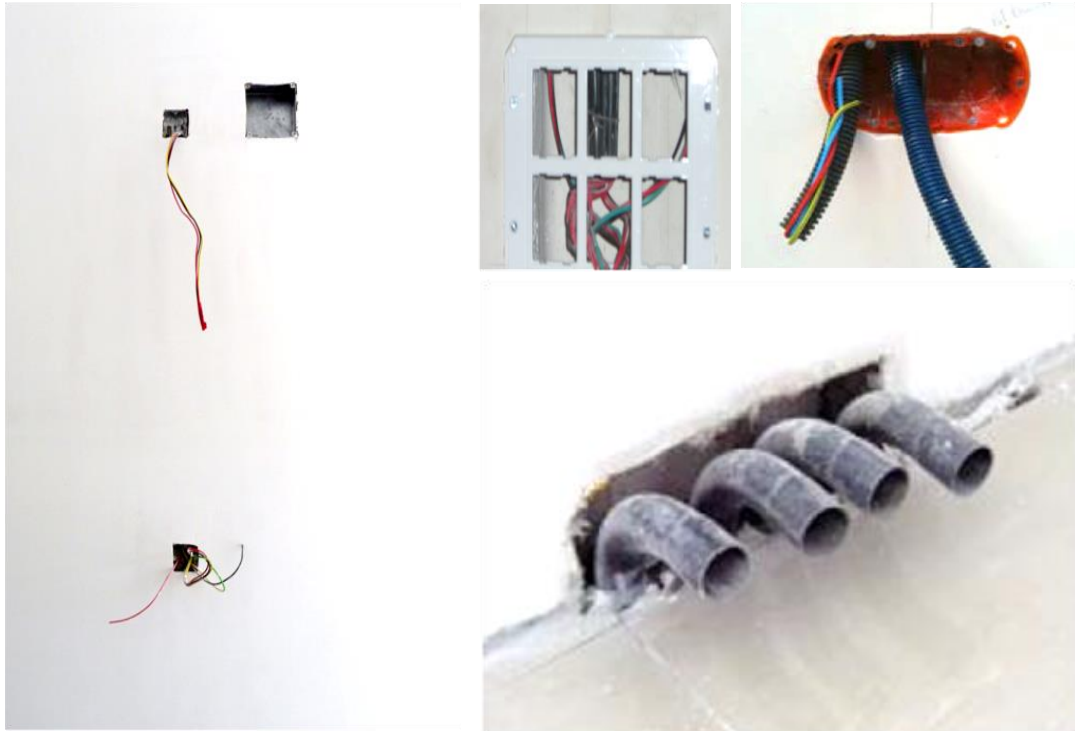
Electrical wiring and pipe connections provided through GFRG panels
